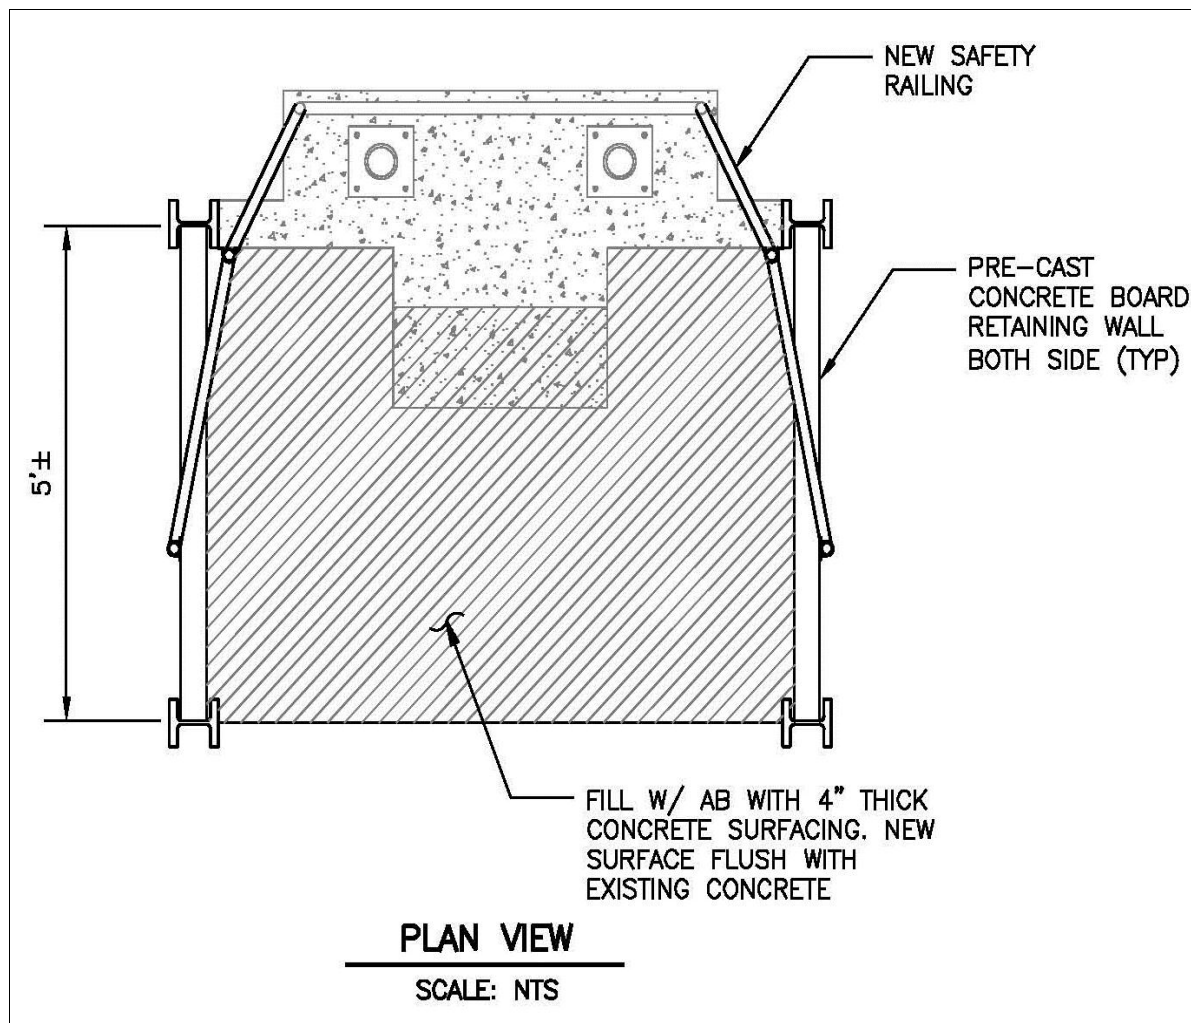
Project Design for Inlet work at Seal Creek Wasteway (overview)
